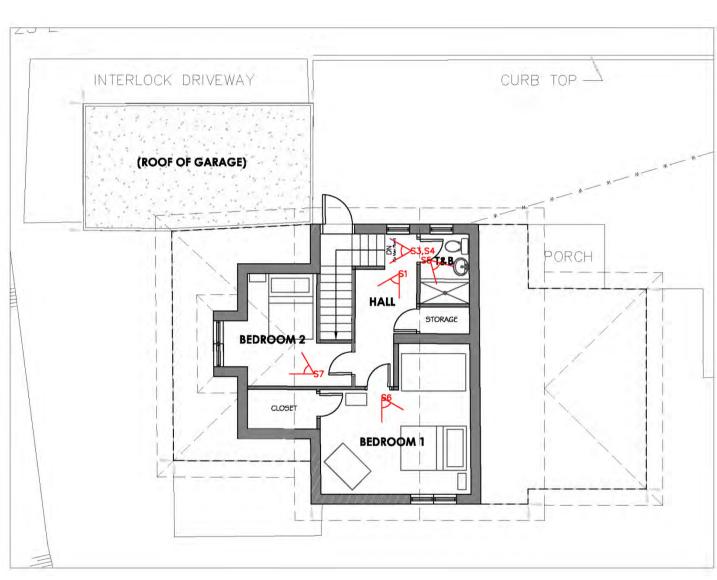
Second Floor Key Plan, not to scale, sketch by AREA, annotated to refer to Photos S-1 to S-7
